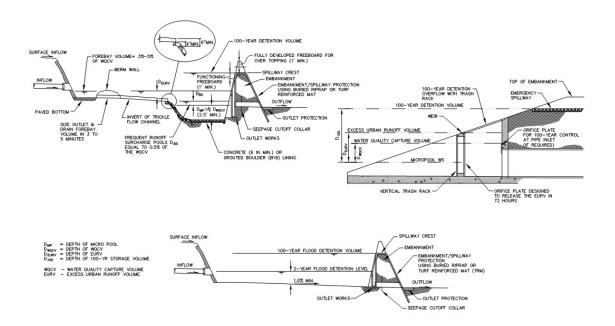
Extended Detention Basin - Cross Section and Outlet Works
